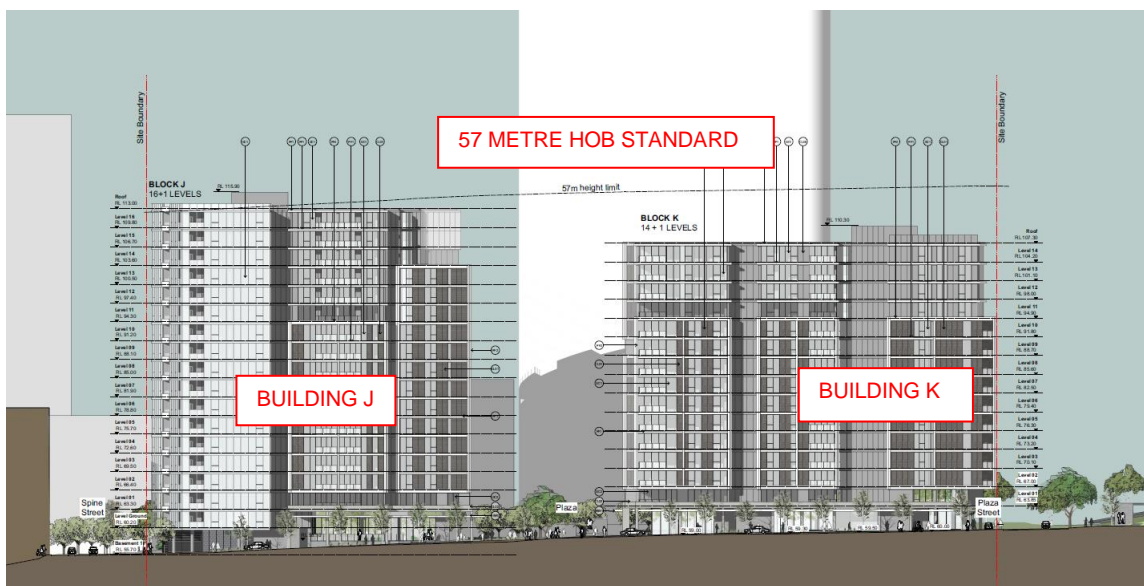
Amended DA West Elevation showing Buildings J and K on Lot 105 (Jervis Circuit)
